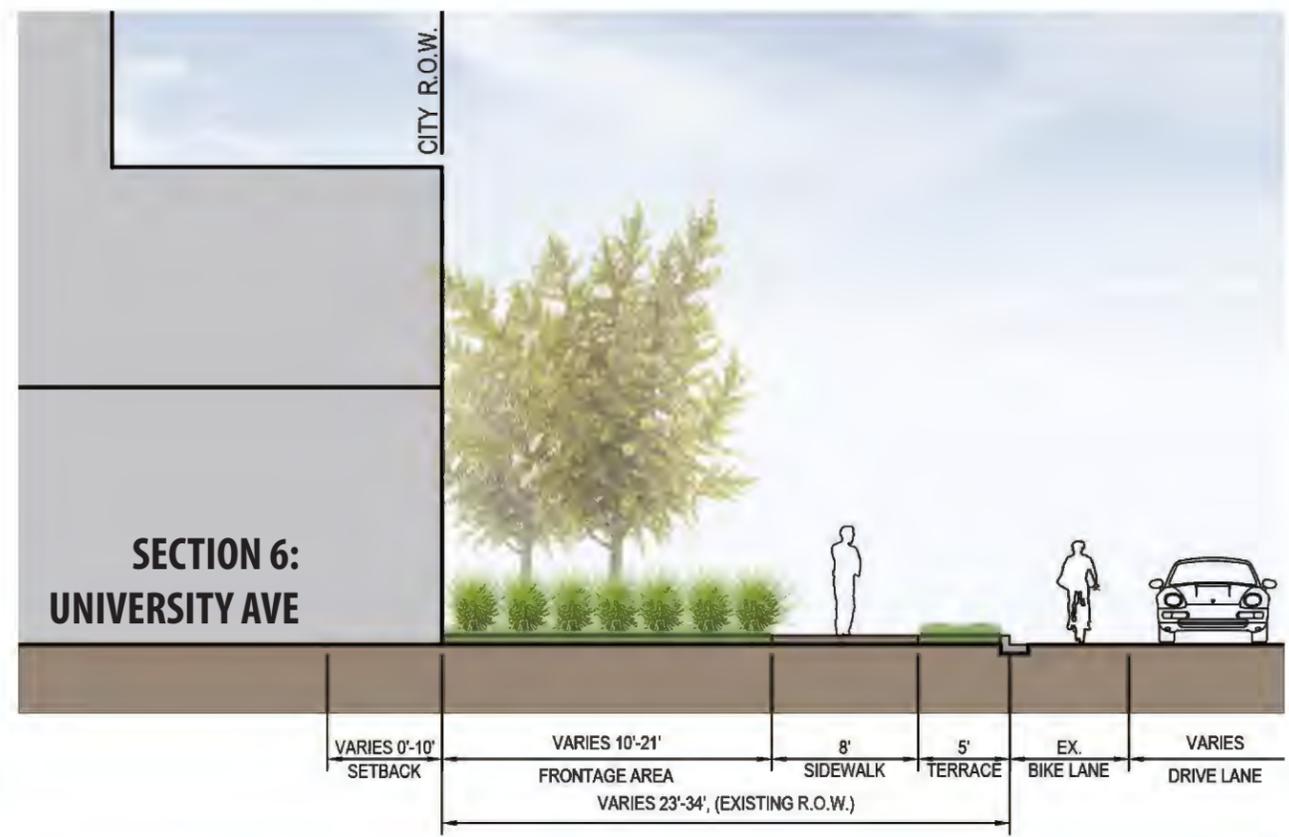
F - PROPOSED STREET SECTIONS - EXTERIOR
